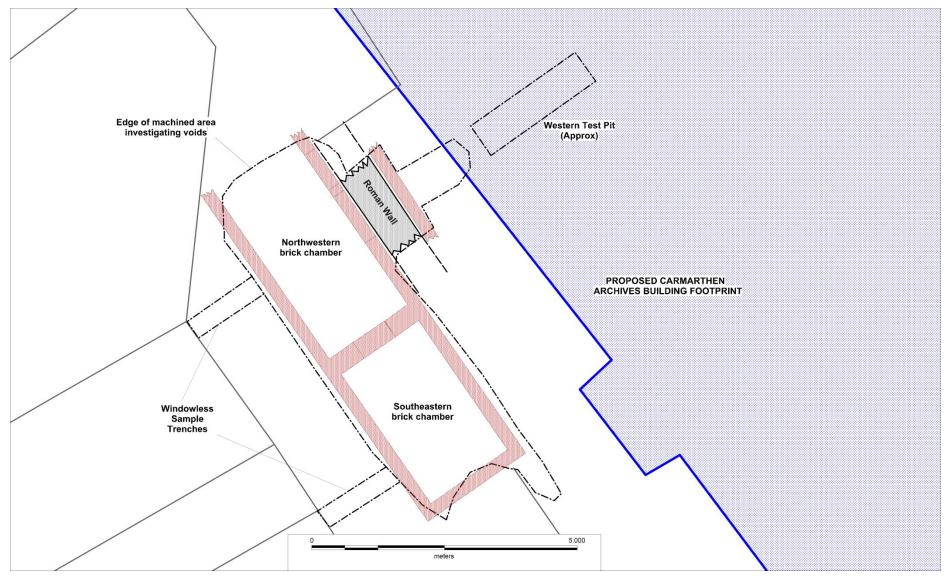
Detailed plan showing location of brick built chambers and Roman wall
